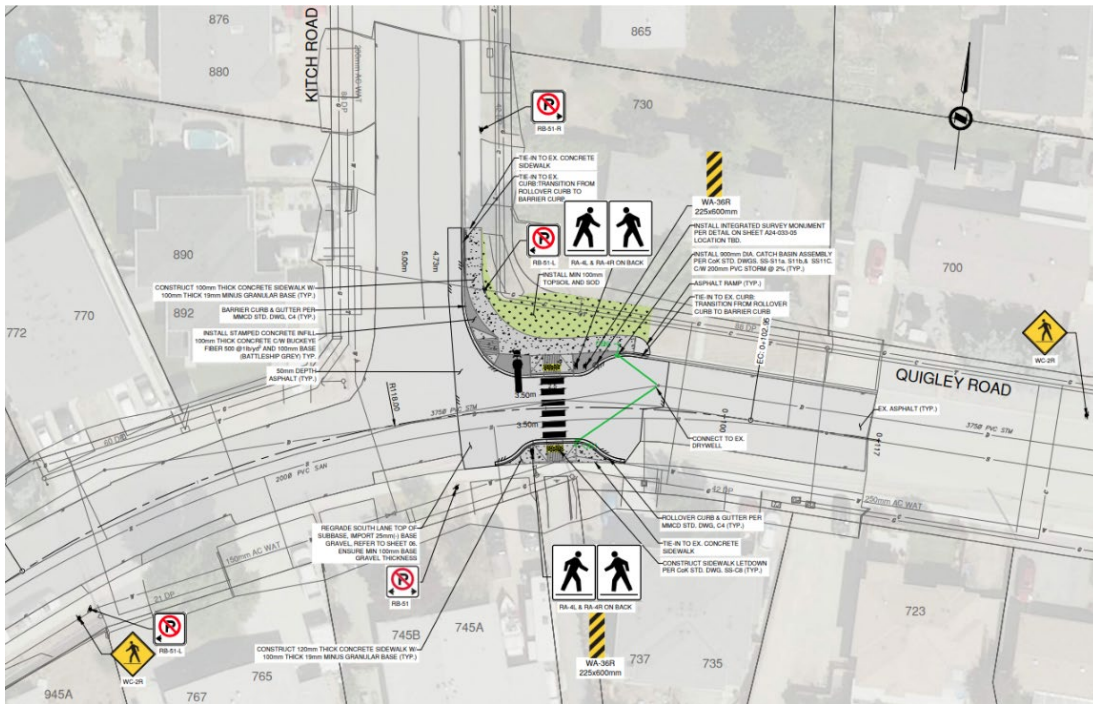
Quigley Rd & Kitch Rd curb extensions and crosswalk design.
